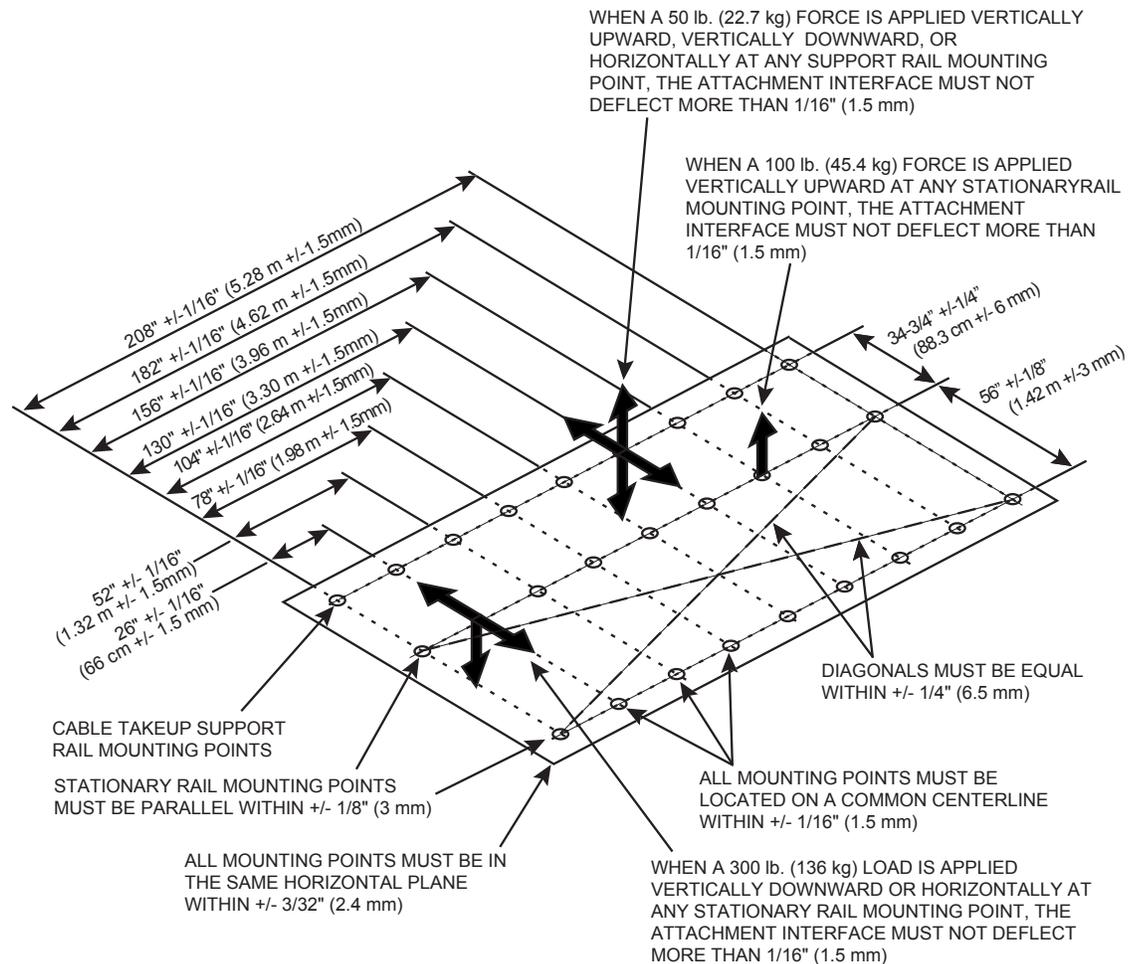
Specifications for a Typical 17 foot-10 inch (5.44 m) Stationary Rail Mounting Interface (Both Rails Ceiling Mounted)
